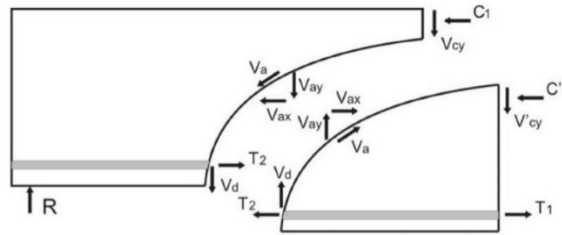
Internal forces of a cracked beam without transverse reinforcement after the emergence of the inclined critical crack, according to Macgregor et al. (1997).
